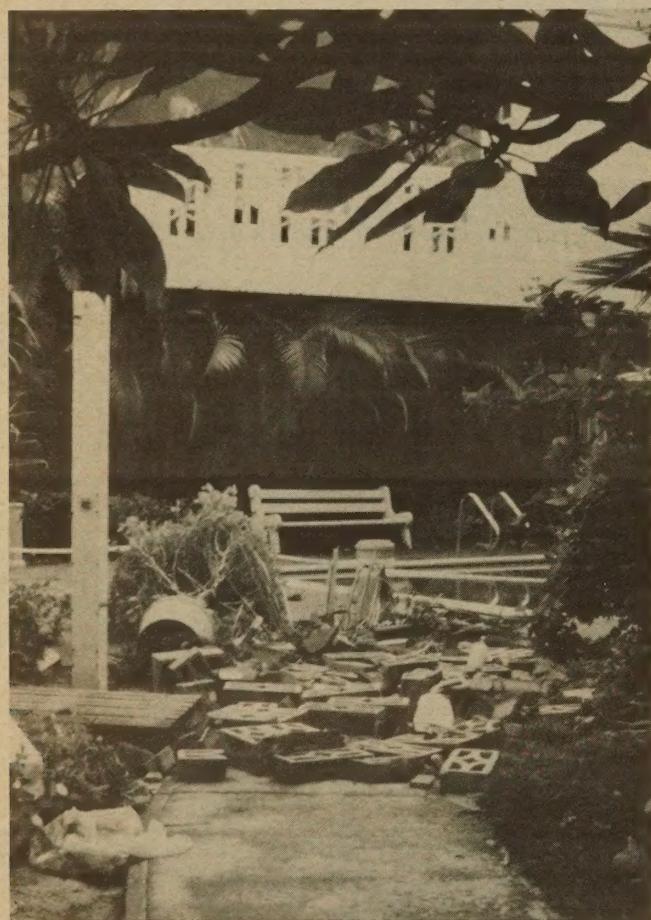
Photo A. Concrete blocks from the seawall were propelled toward the swimming pool at this Oahu QTH.
